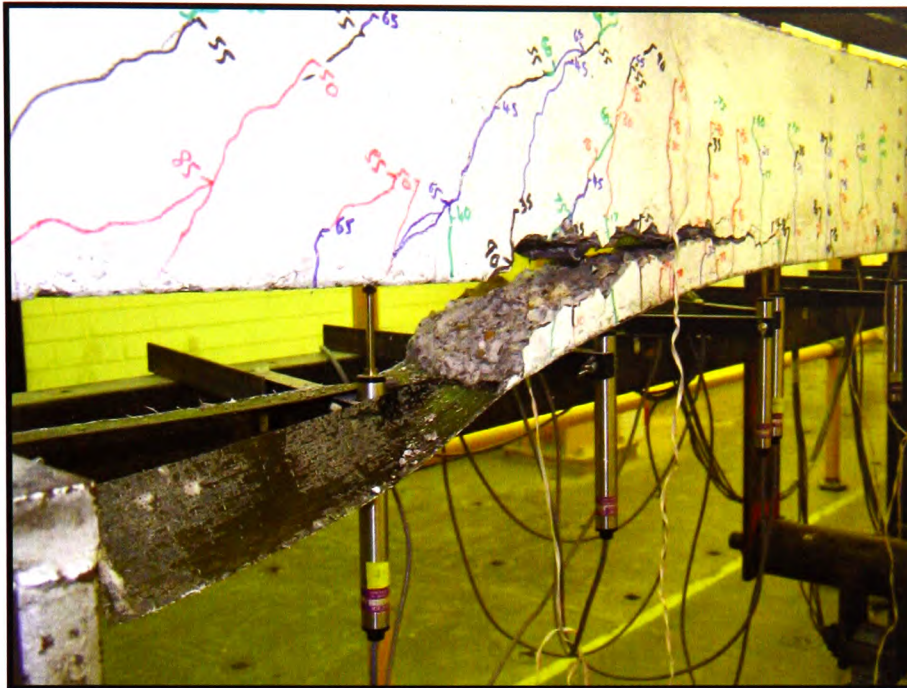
Photograph of failure of 12DCF2 due to debonding of the CFRP sheet and tearing-off of the concrete cover
